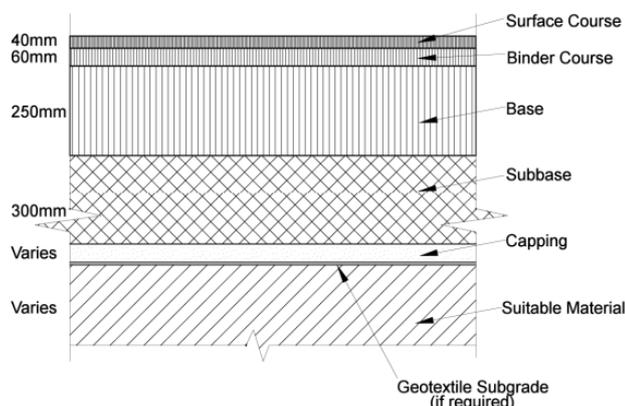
DCC Construction Standards for Roads and Street Works – Bus Corridor – Asphalt Road (indicative 80msa design)
